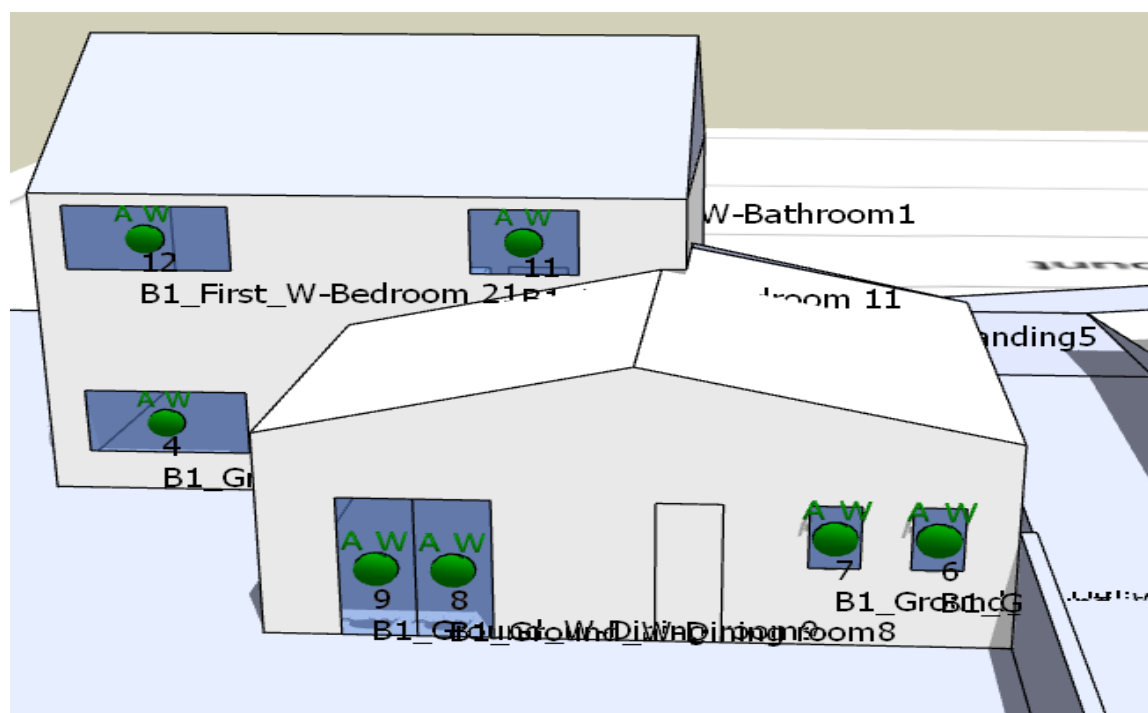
Surrounding Buildings B1-Rear elevation windows to be assessed (8 St Michaels Mount)
